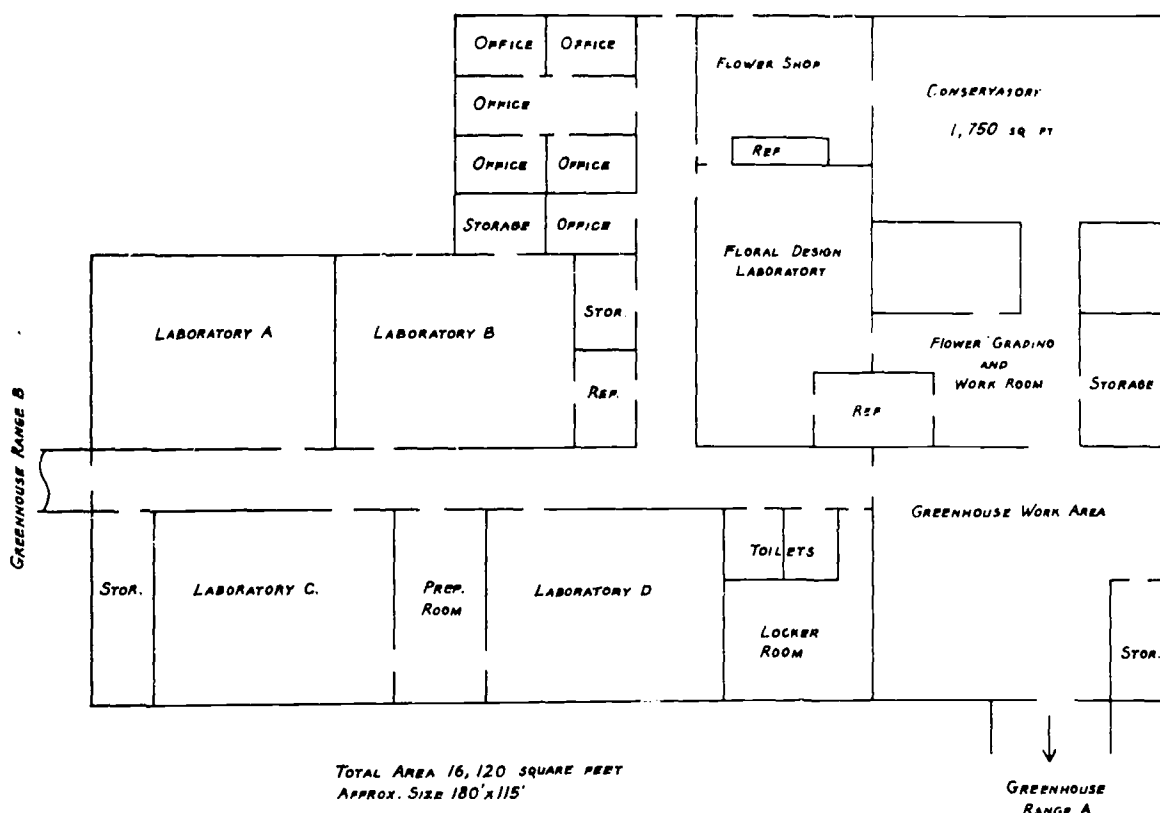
Suggested floor plan for ornamental horticulture headhouse.
